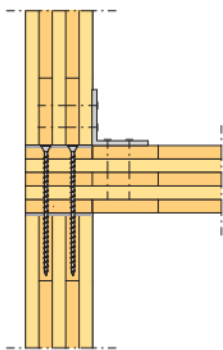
Joint between wall panel and floor slab using angle bracket.
